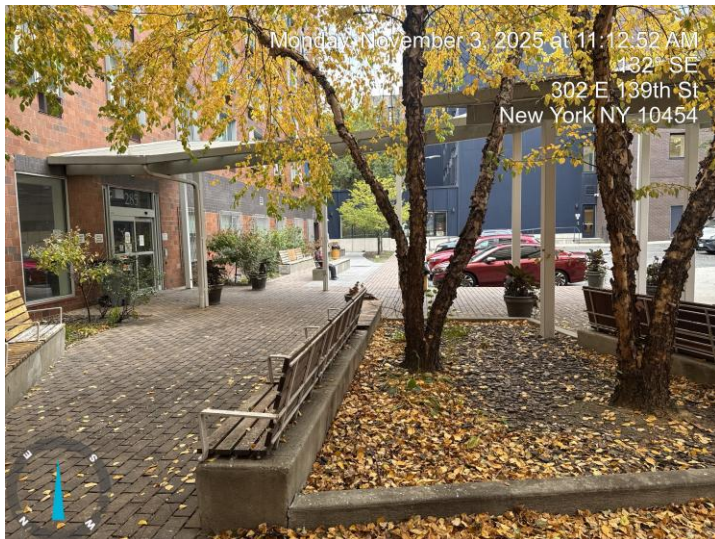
The safety surface cover system in the rear courtyard of the Tres Puentes East Building Site, facing south..
